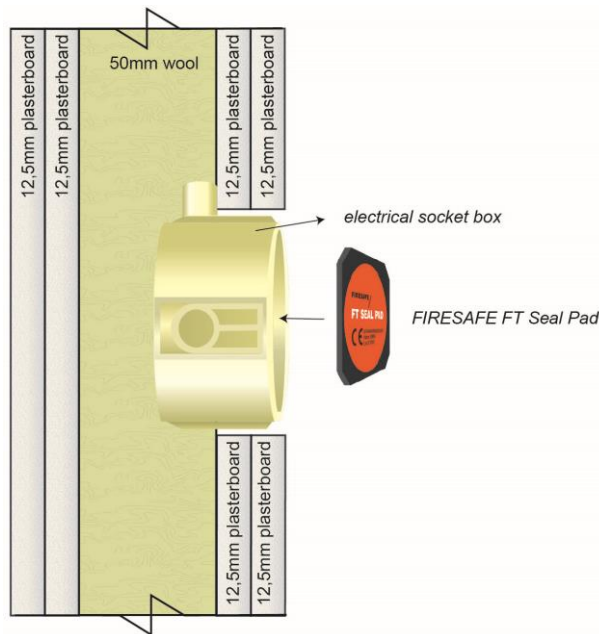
One to five electrical wall boxes in a row on one side of a flexible wall – sectional view
